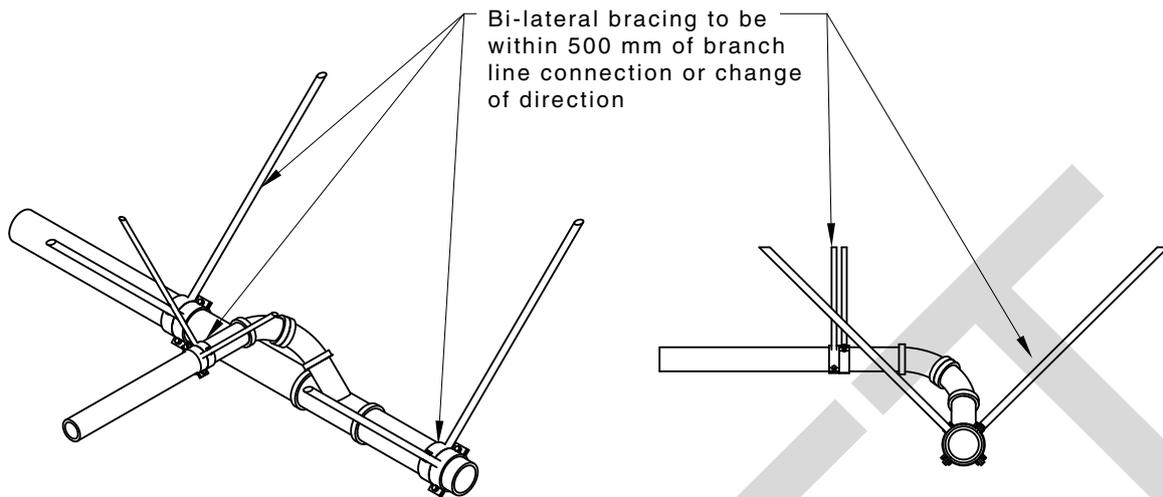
BILATERAL BRACING DETAILS
